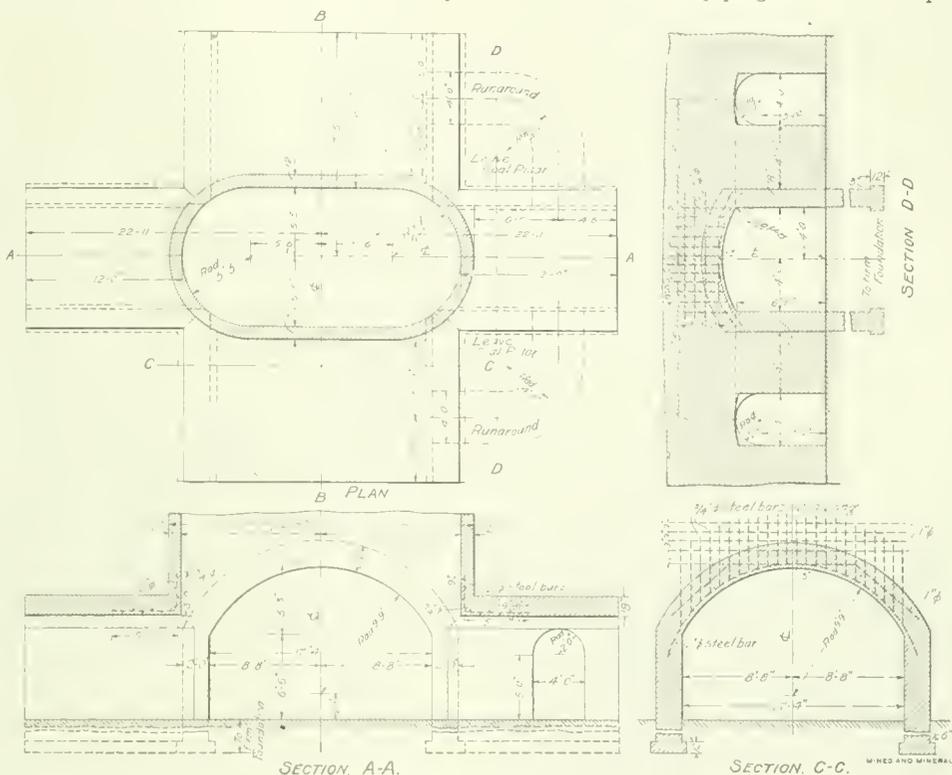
CONCRETE WORK AT SHAFT BOTTOM
